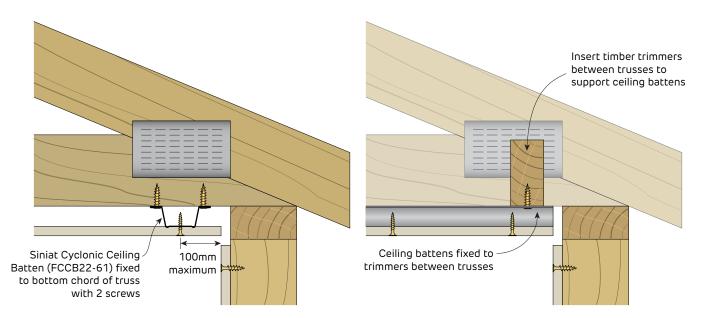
Direct Fix Ceiling to Roof Truss 22mm Cyclonic Batten perpendicular to trusses Section
